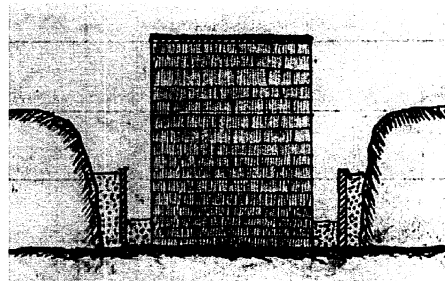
Installation of the transit telescope pier (after Newcomb, n.d.:10).
